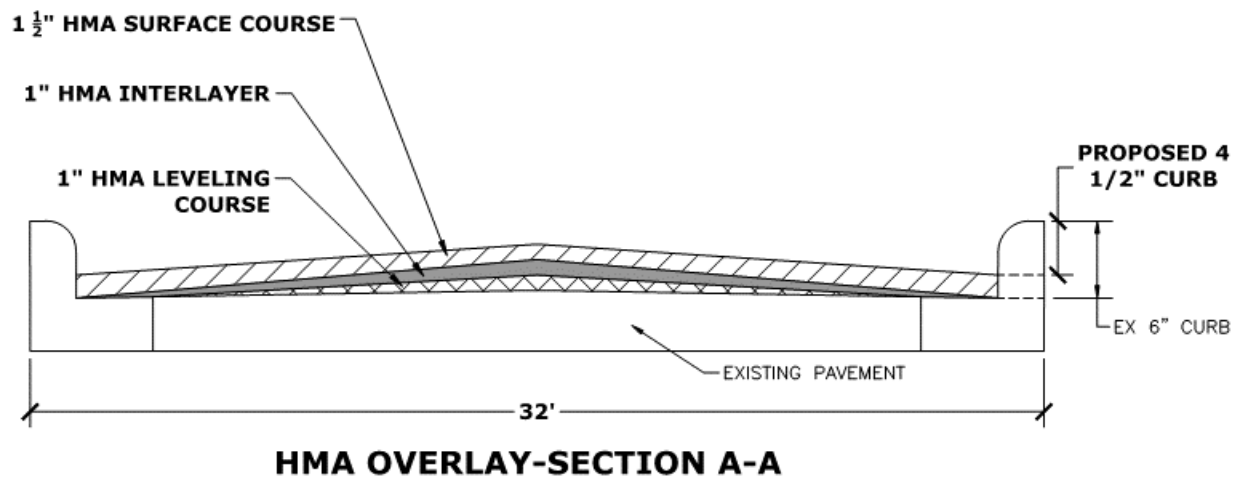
Proposed HMA Overlay Section for Curbed Pavement
